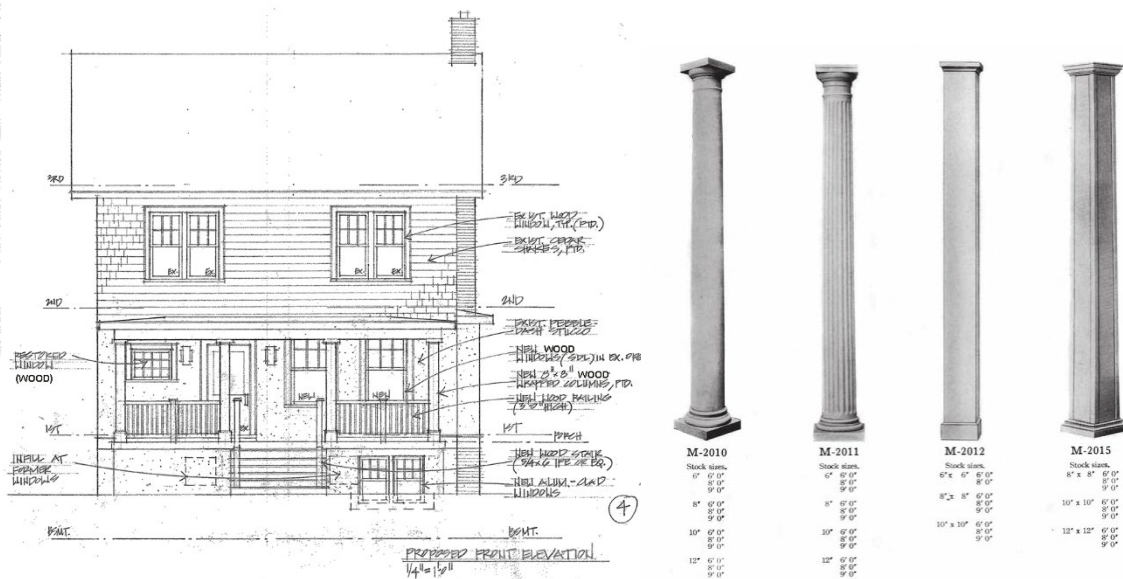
View off the proposed front elevation (left) and columns from a 1921 trade magazine (right).
